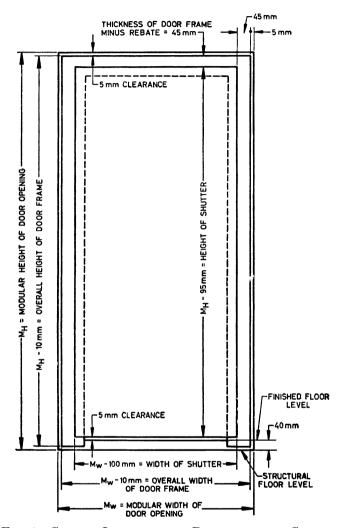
SKETCH ILLUSTRATING DIMENSIONS OF SHUTTER
